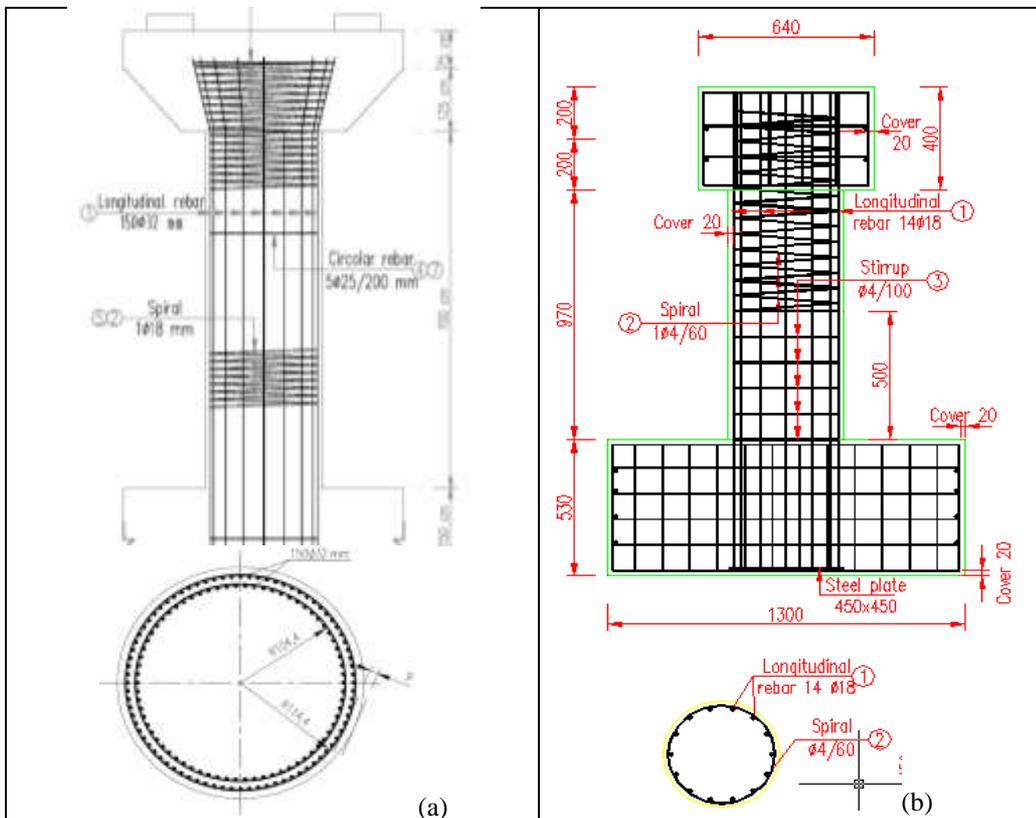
Chinese rc bridge: a) most stressed pier geometries and longitudinal and transversal steel reinforcements; b) pier specimen (scale 1:6) geometries and longitudinal and transversal steel reinforcements.
